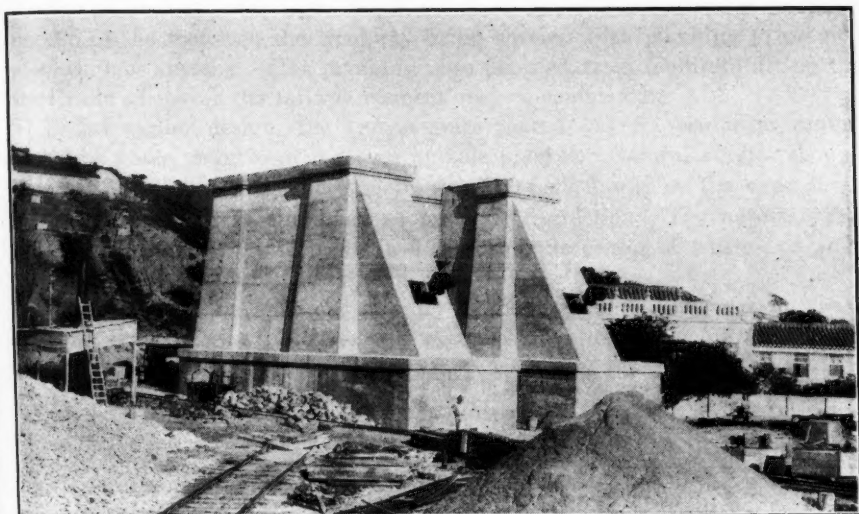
CONTINENT ANCHORAGE, COMPLETED, FLORIANOPOLIS BRIDGE.
